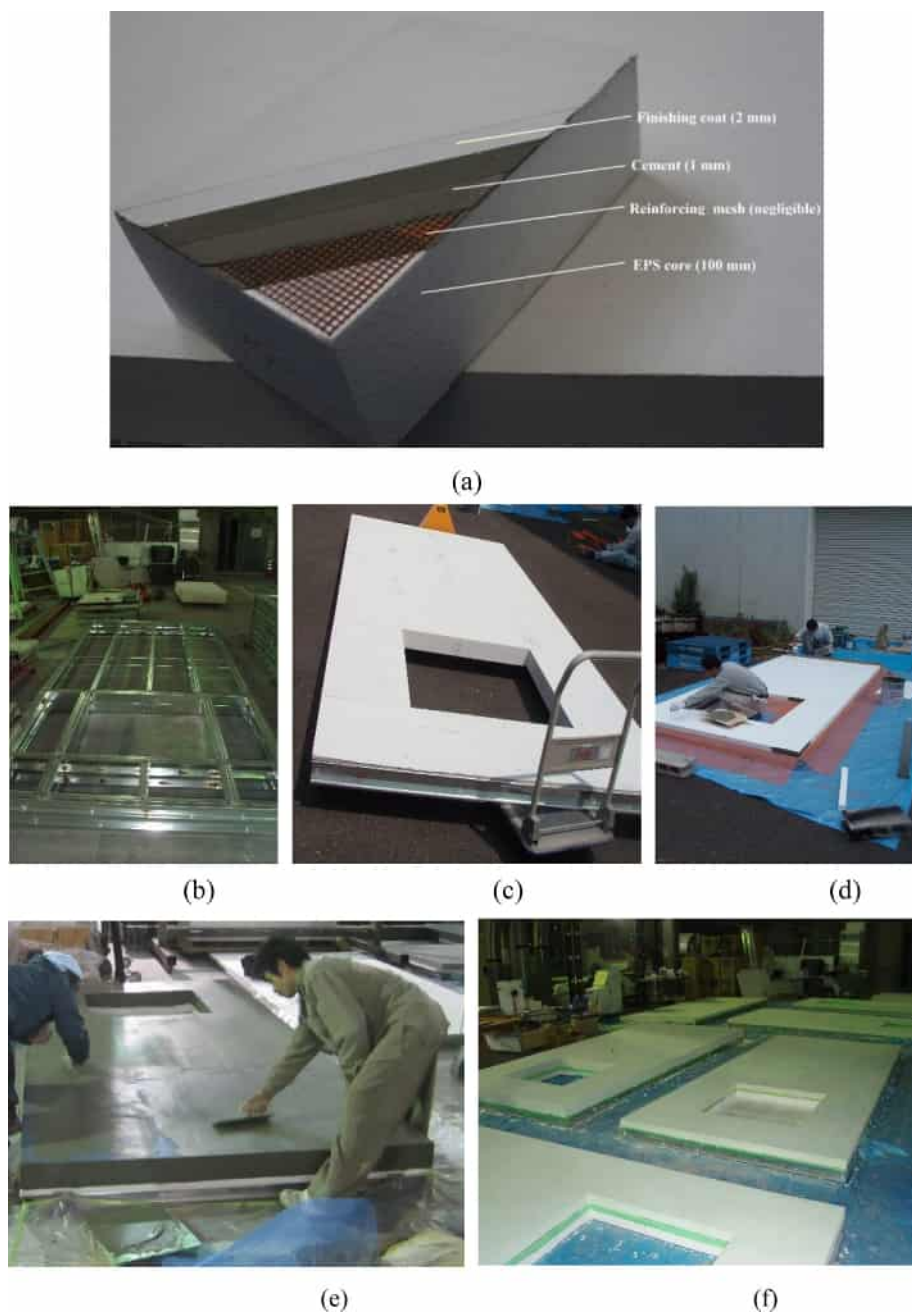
The description of EPS ETICS specimen preparation (a) The horizontal section EPS ETICS specimen (b) specimen support frame (c) specimen substrate (d) EPS panel laying on specimen substrate (e) cement laying on reinforcing mesh (f) finishing coat laid on the cement.
